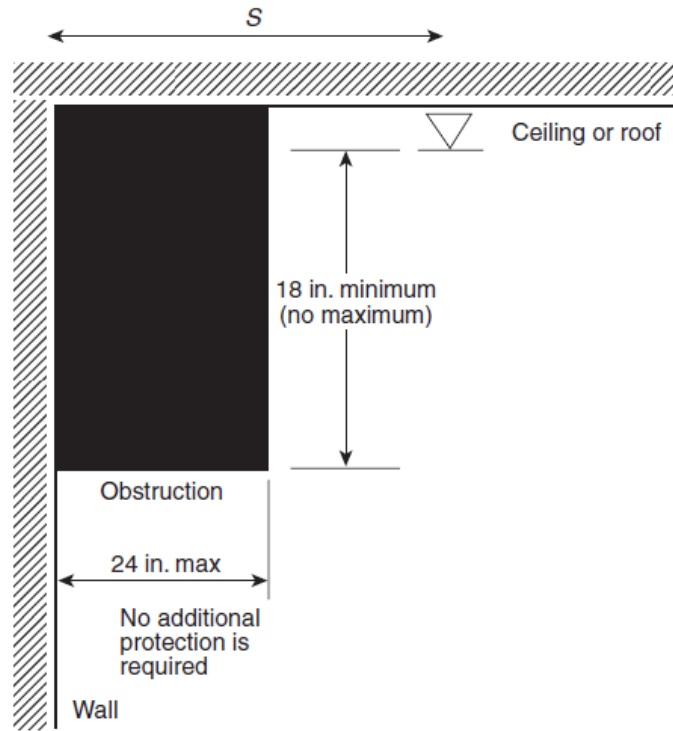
(c) Obstructions Against Walls (Extended Coverage Upright and Pendent Spray Sprinklers).
